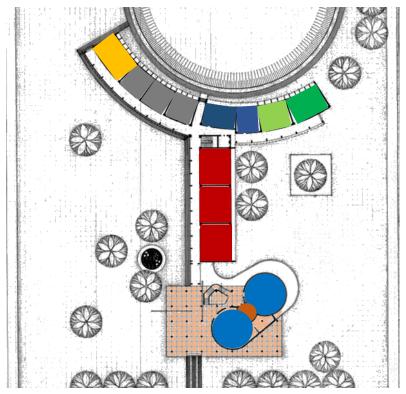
Geometric pattern of the Ground Floor Plan: rectangular & circular forms. (Archive, n.d.)
